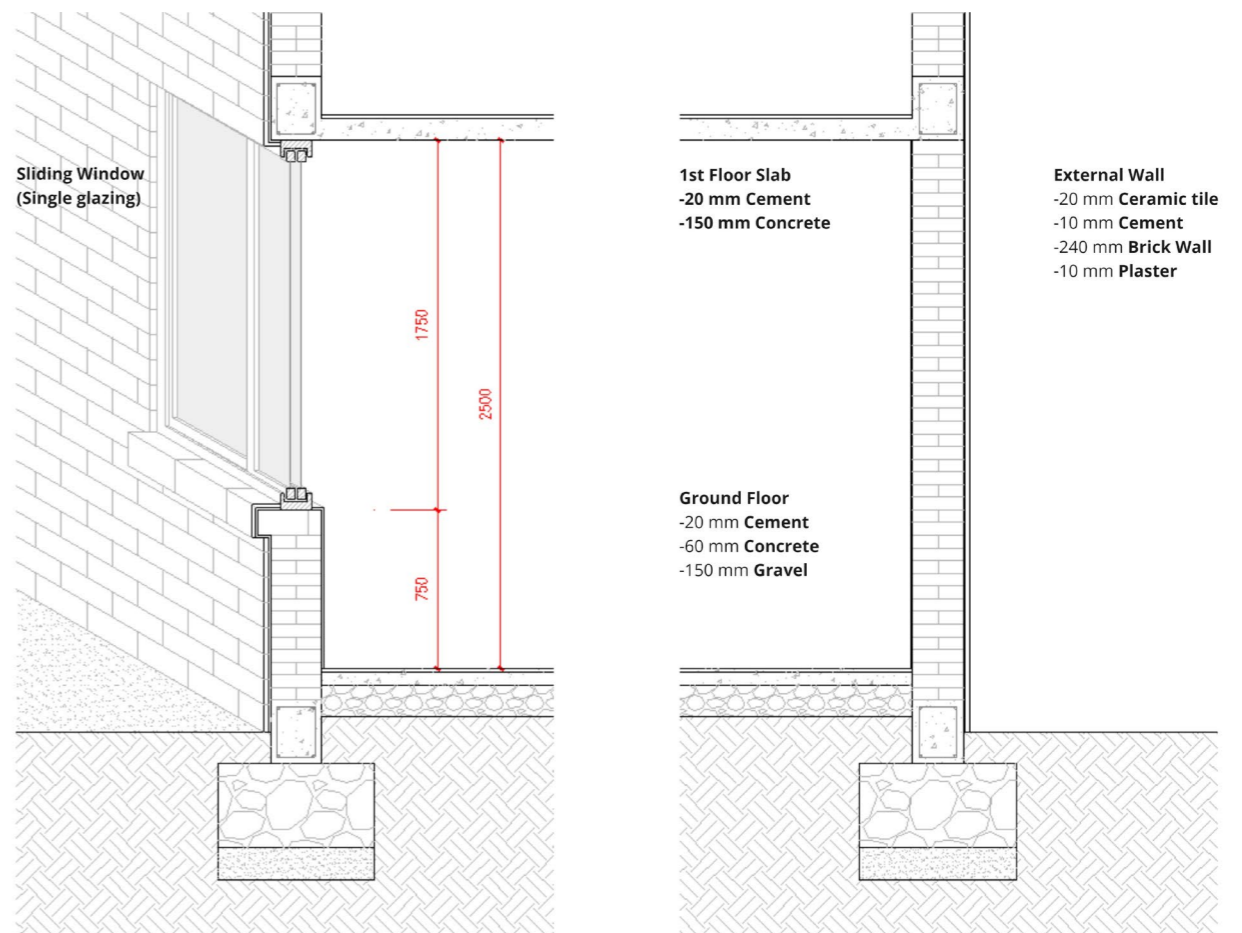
construction layers of the room - conventional brick and concrete structure in rural Yunnan
